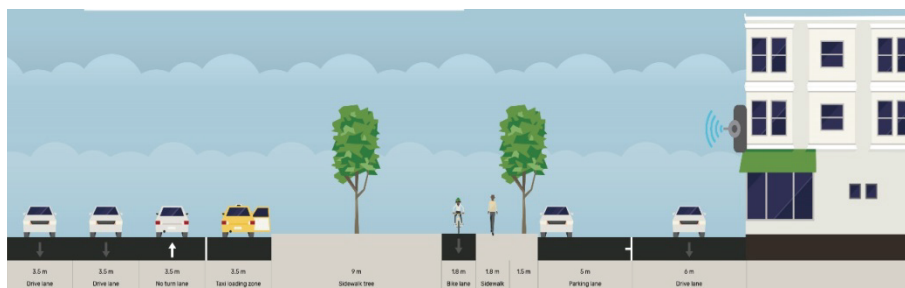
Street section of the monitoring and modeling location, with the position of the monitoring sensor.
